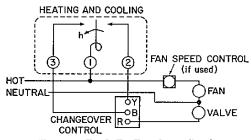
T26S, T26T on fan-coil unit with cycling valve and continuous fan. Terminal markings shown for A19CAC changeover control.
